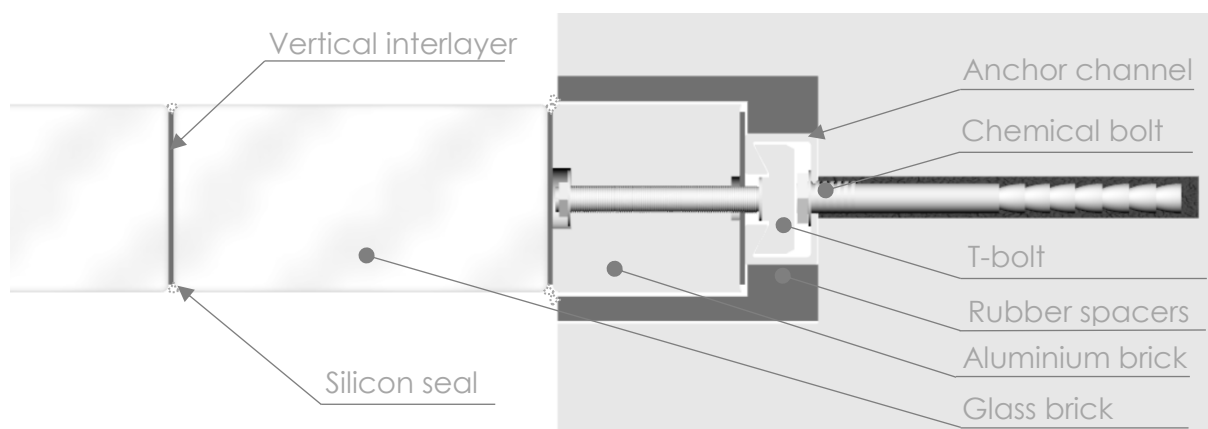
Detailing of the connection between historic wall and glass system (shown through a cross-section of the aluminium half-brick).
